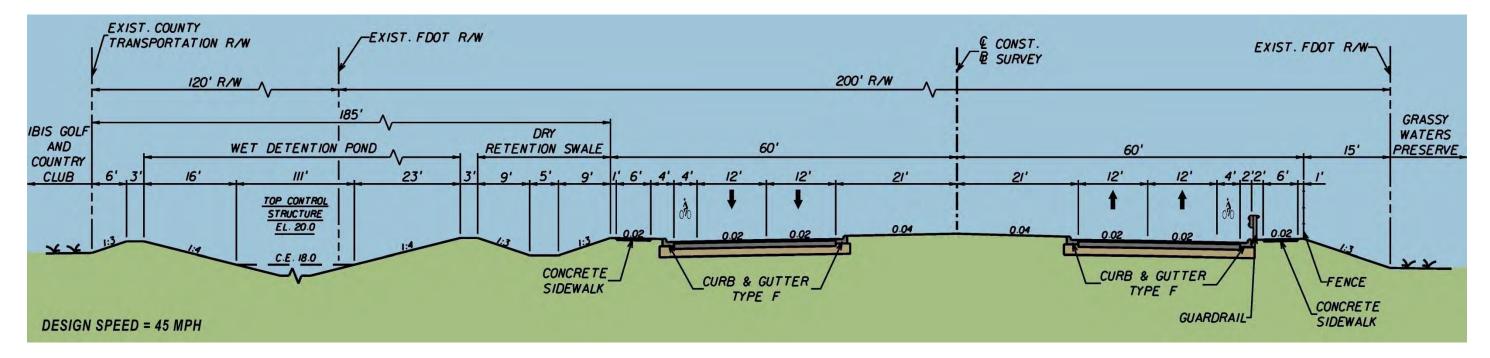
Proposed Typical Section-East Alignment, Parallel to Ibis
